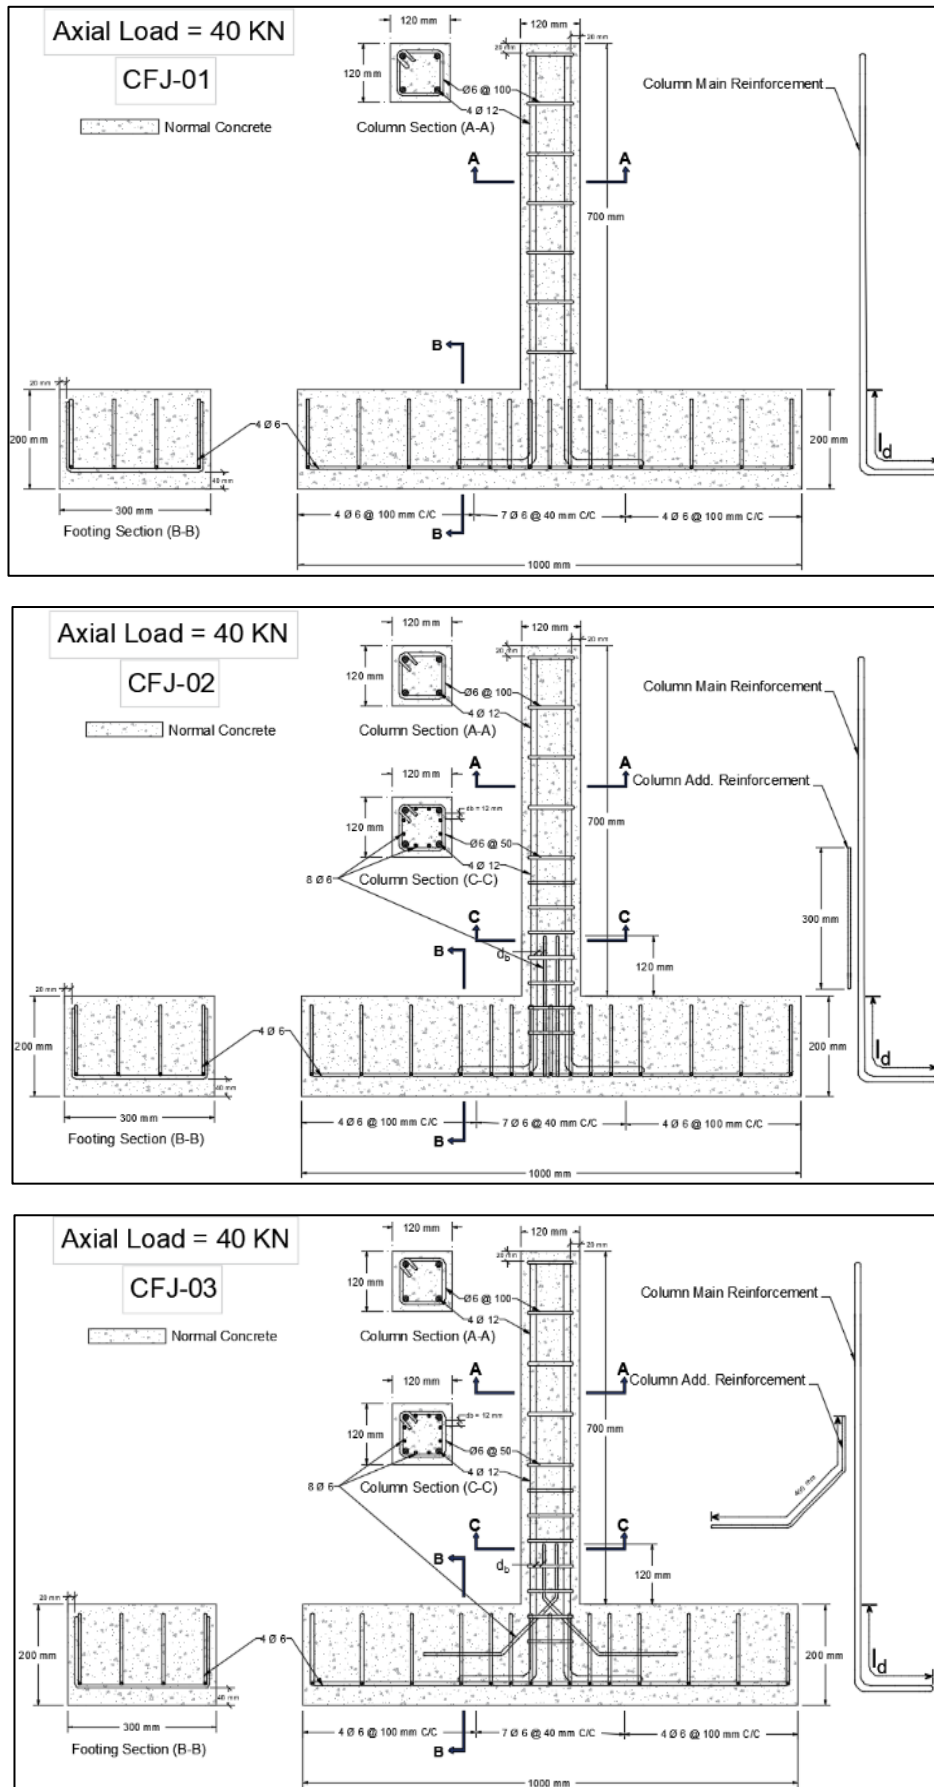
Typical geometry and reinforcement details of the column–footing joint specimens (same reinforcement for all specimens; axial loads of 40 kN and 70 kN were applied) specimens
